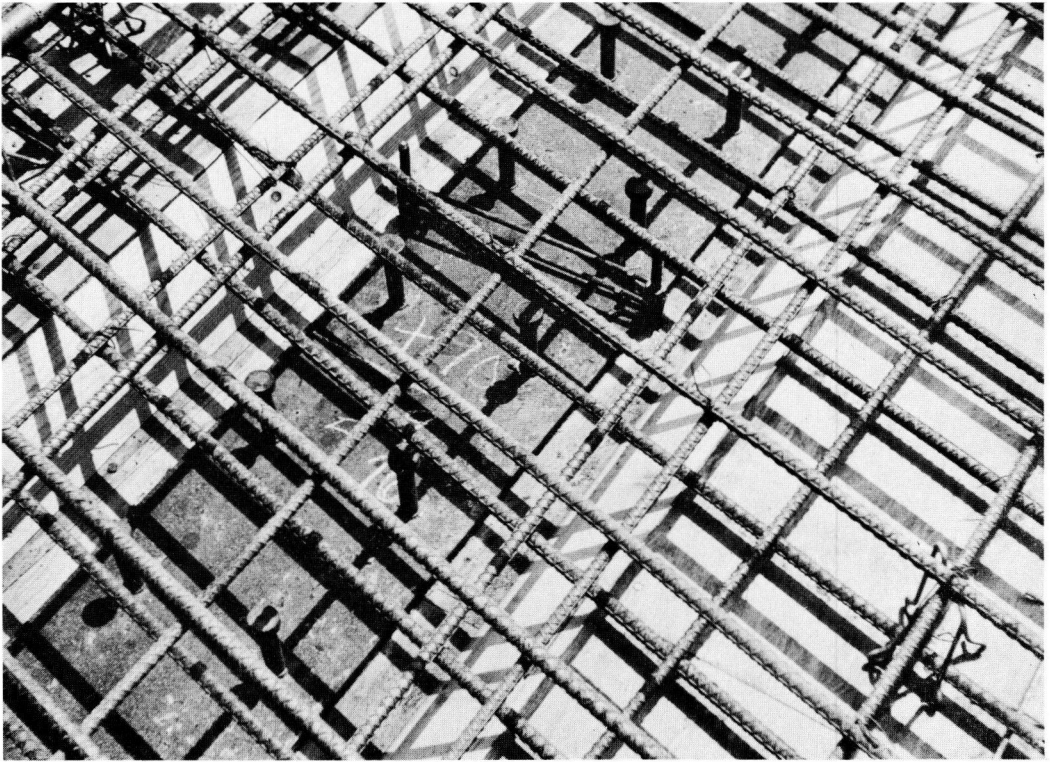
Depth of haunch from top of beam to underside of slab should be variable to permit adjustment for actual camber.
